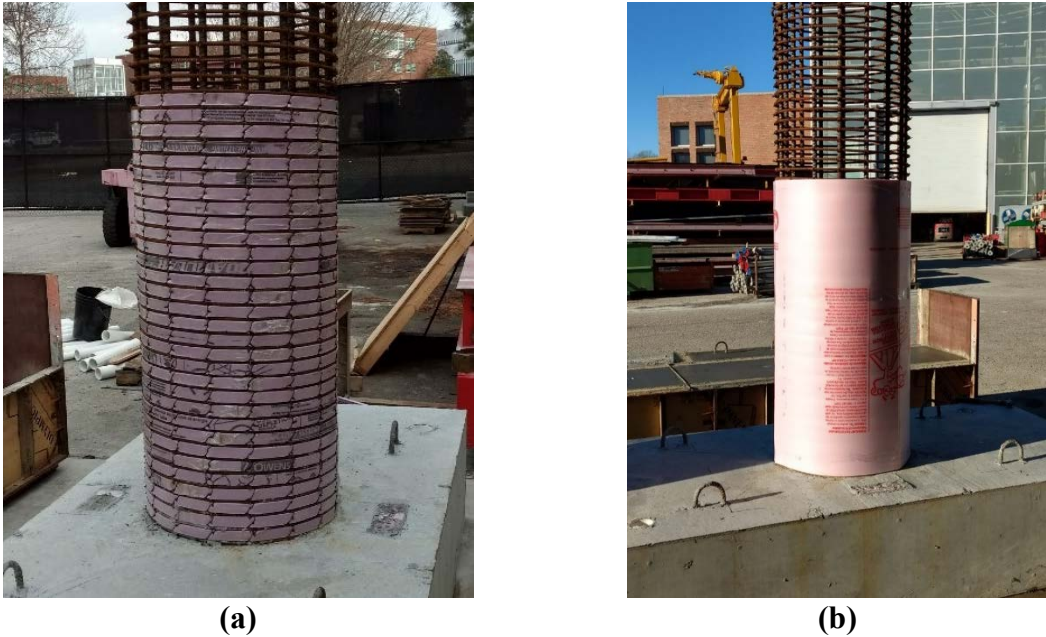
(a) Cover concrete block-out strips; (b) Cover concrete block-out sheet
